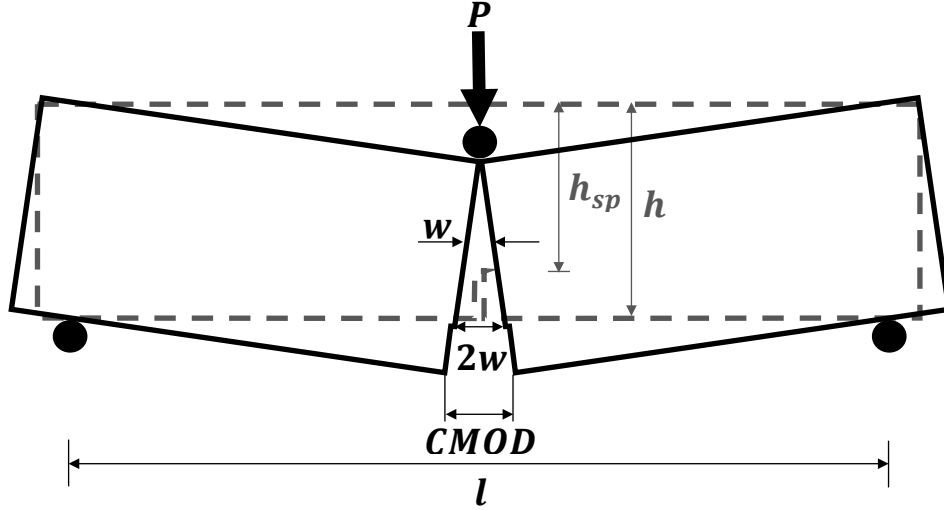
Simplified 3PB test schemes of beam failure and crack opening.
